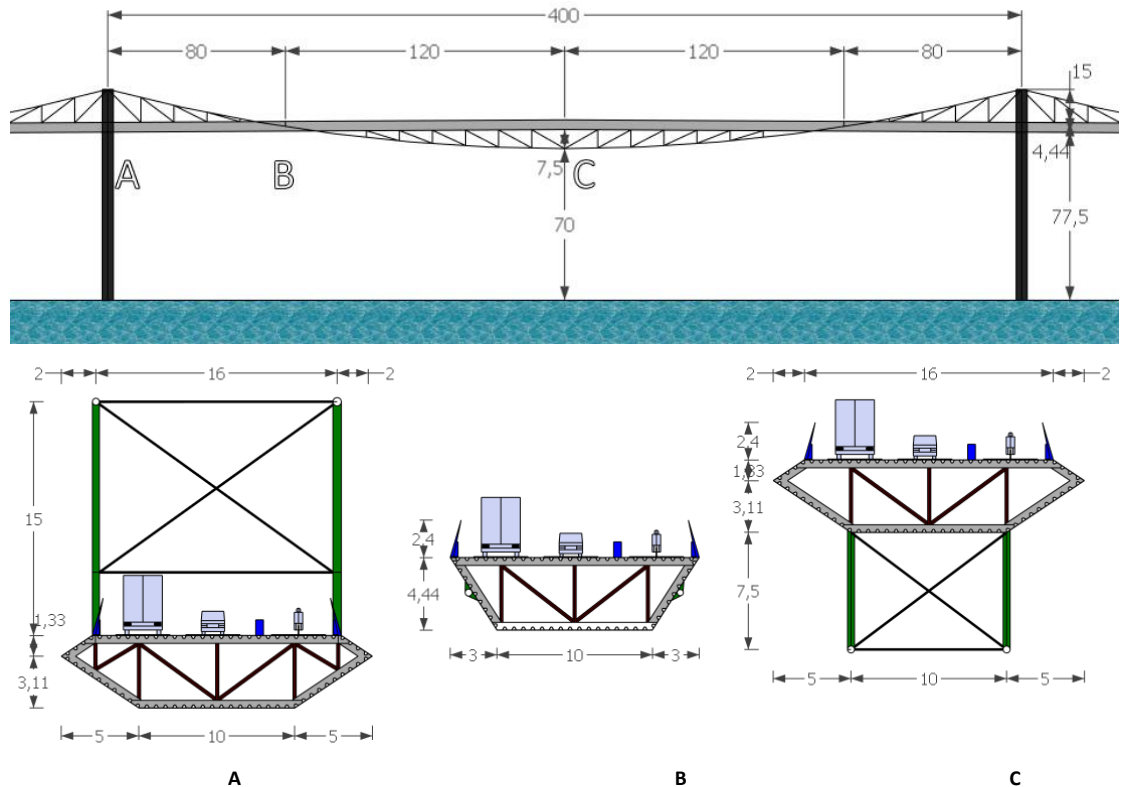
CROSS SECTIONS OF BRIDGE GIRDER ALONG SPANNING LENGTH
